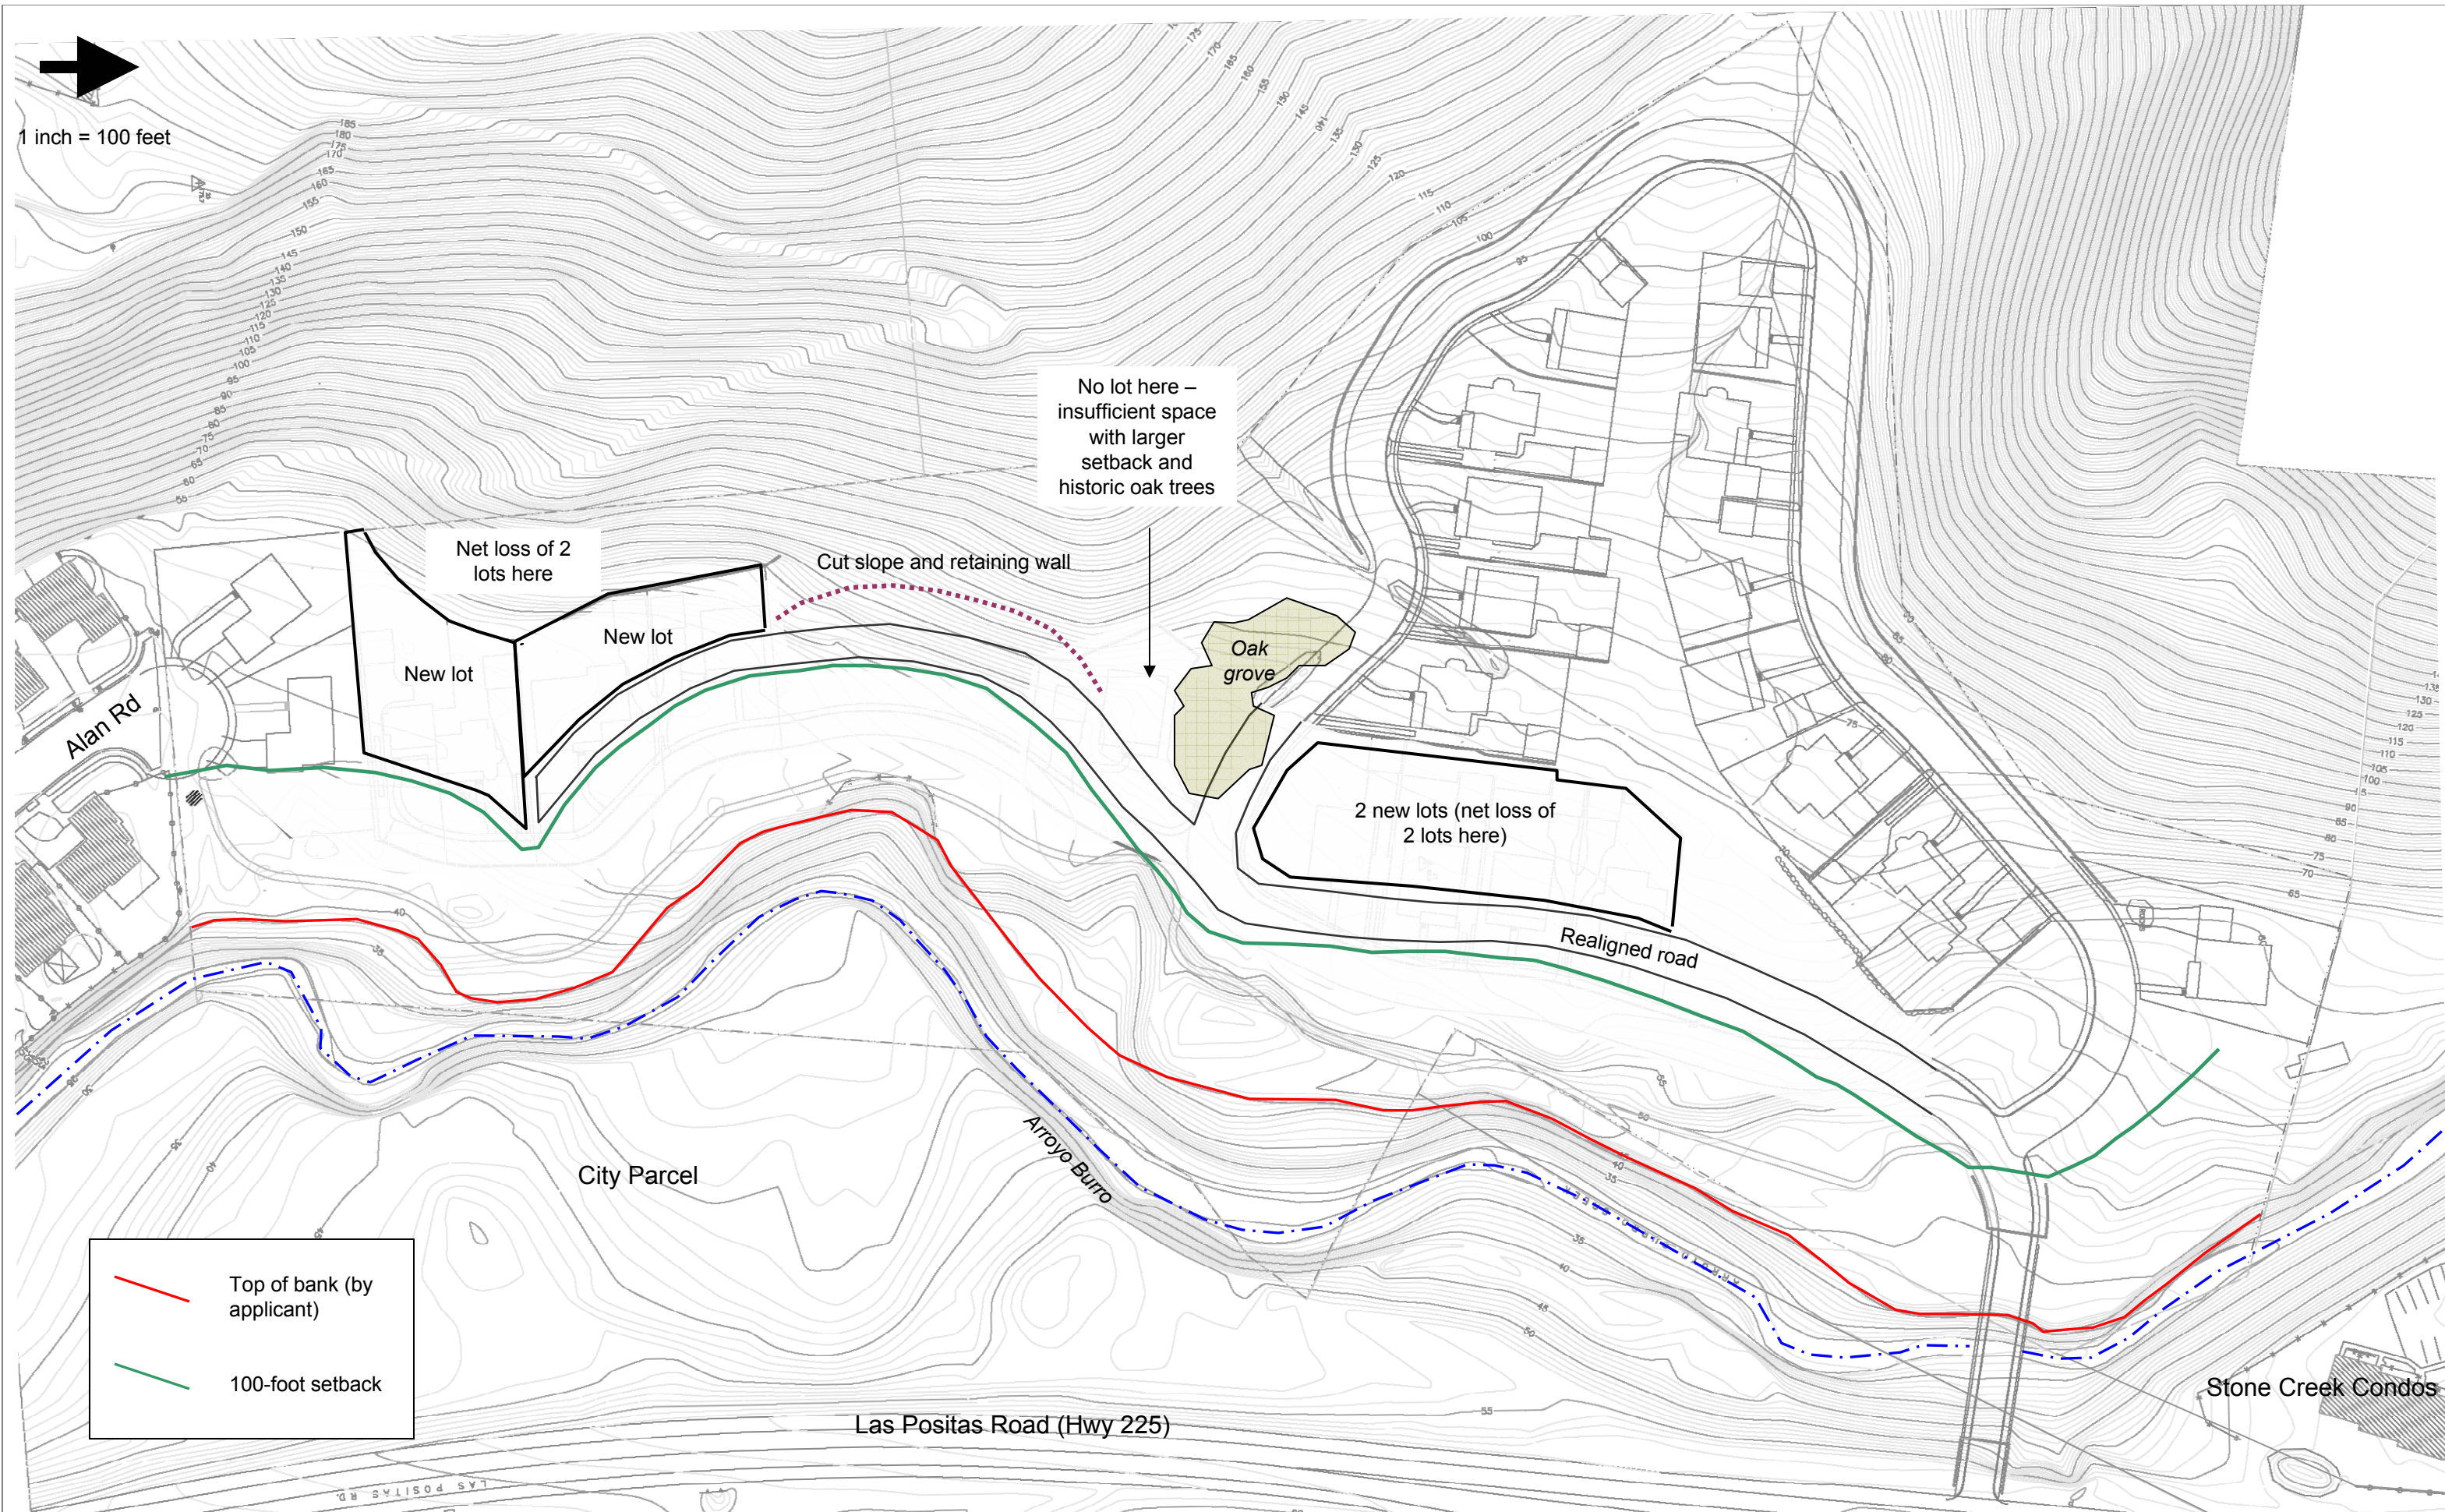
100-foot Creek Setback (Applicant Top of Bank)
